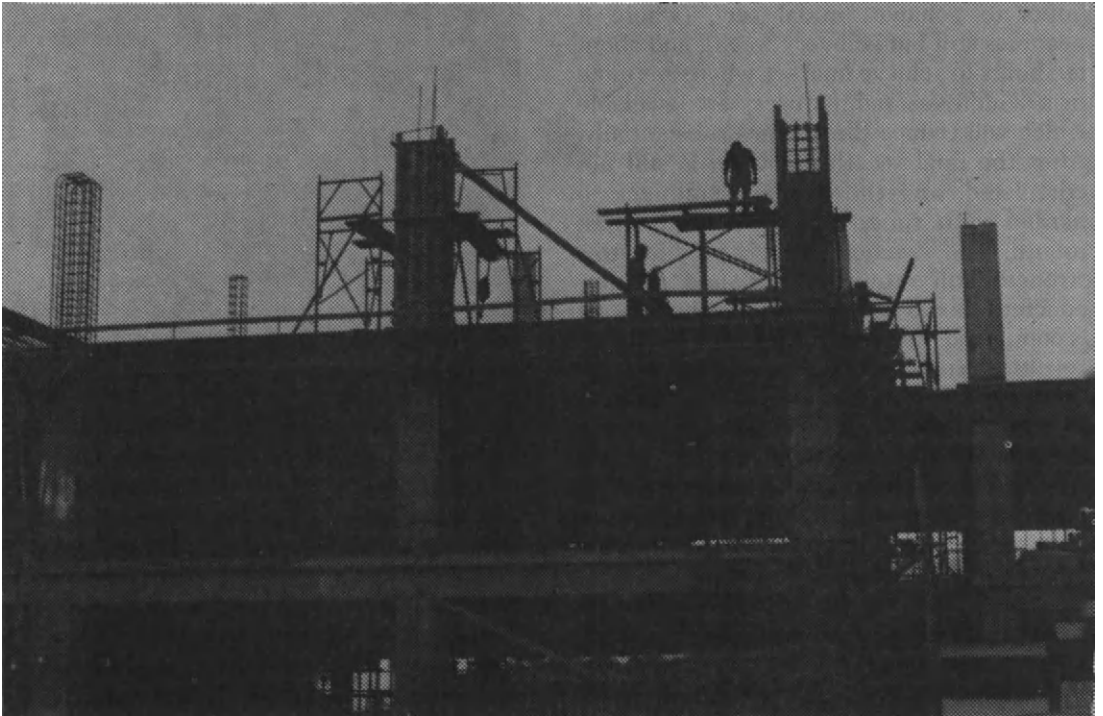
(d) Three storey building showing formwork and reinforcing of pillars.
